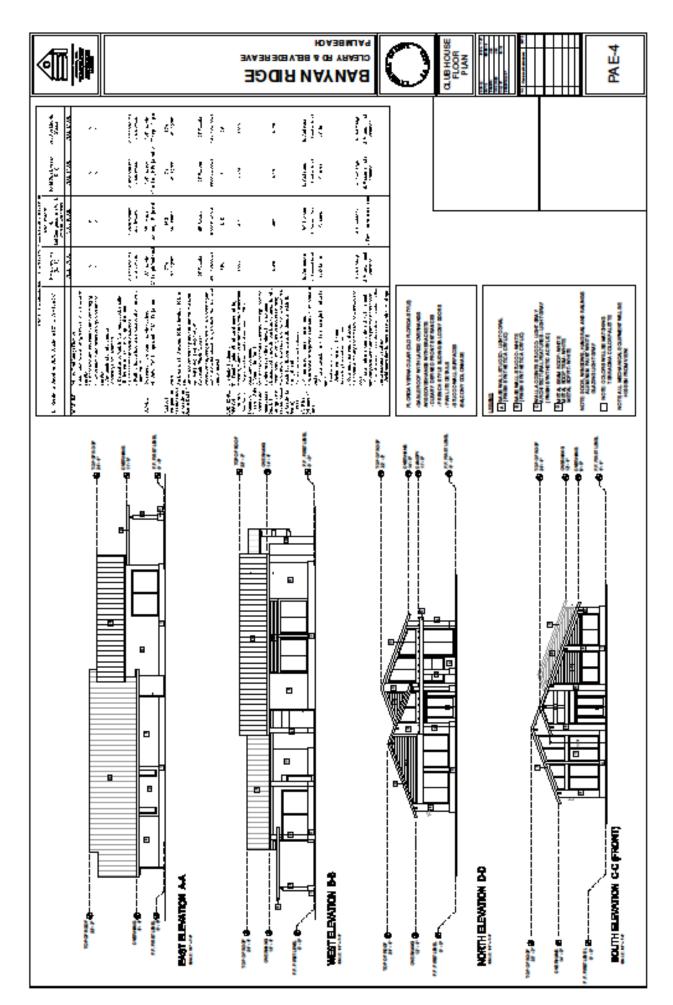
Preliminary Architectural Elevations dated August 13, 2018. (Sheet 4)
